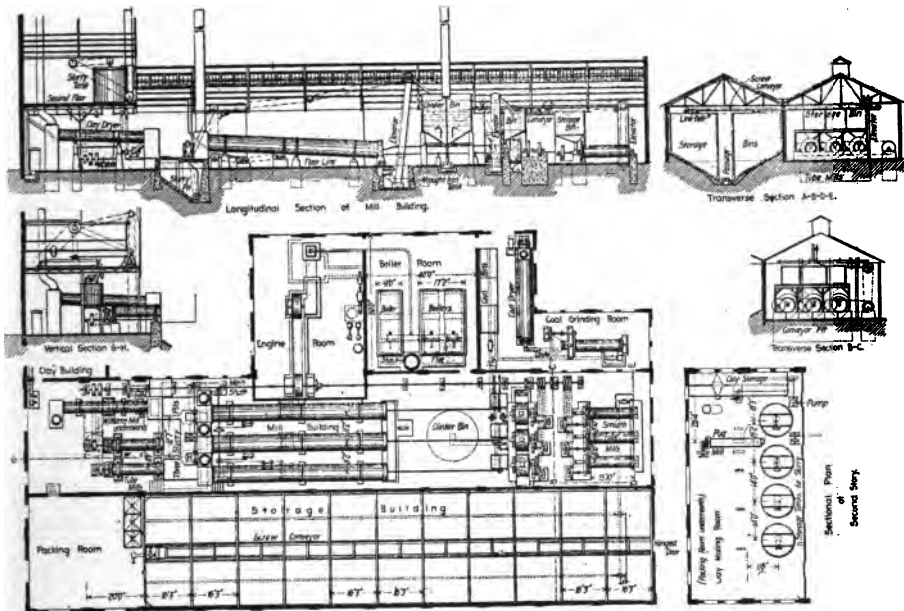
GENERAL PLAN AND SECTION, MICHIGAN ALKALI CO.'S CEMENT PLANT.
